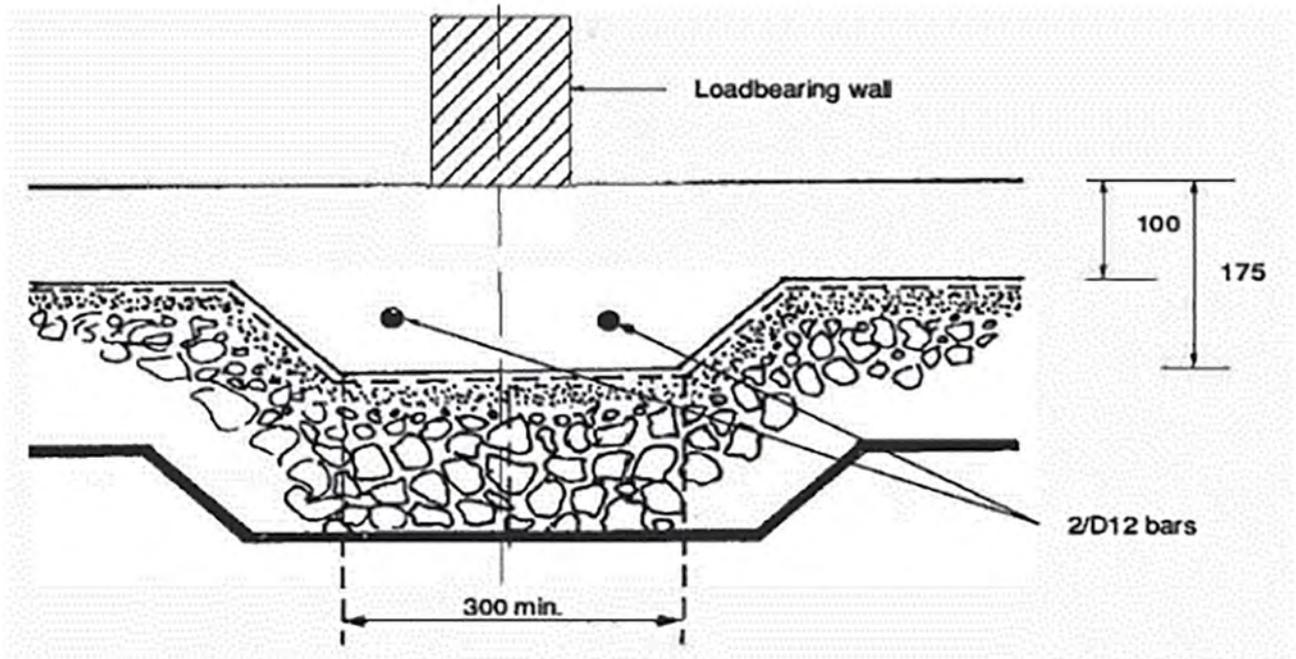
GROUND SLABS BENEATH INTERNAL LOADBEARING WALLS
